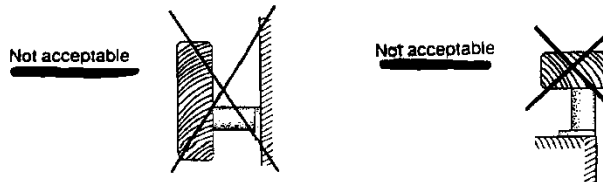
The first option requires handrails to not be less than 1 1/2 inches or more than 2 inches in cross-sectional dimension.
